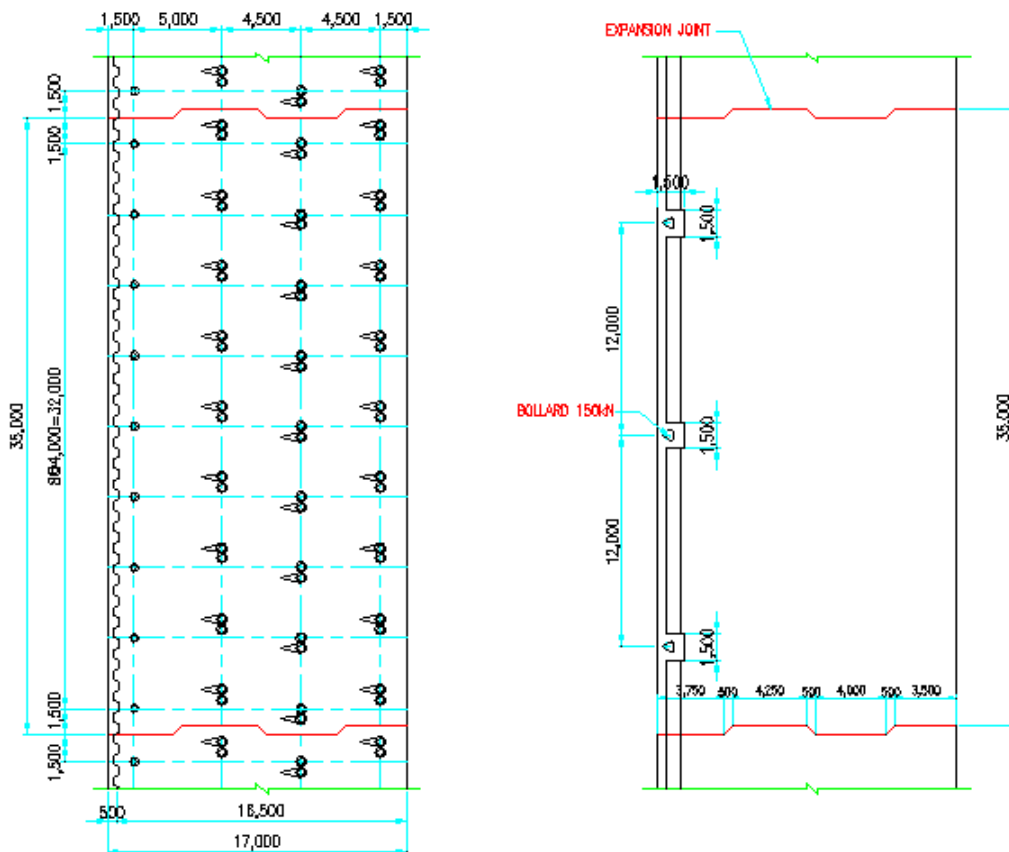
Plan of Pile Foundation and Relieving Platform
